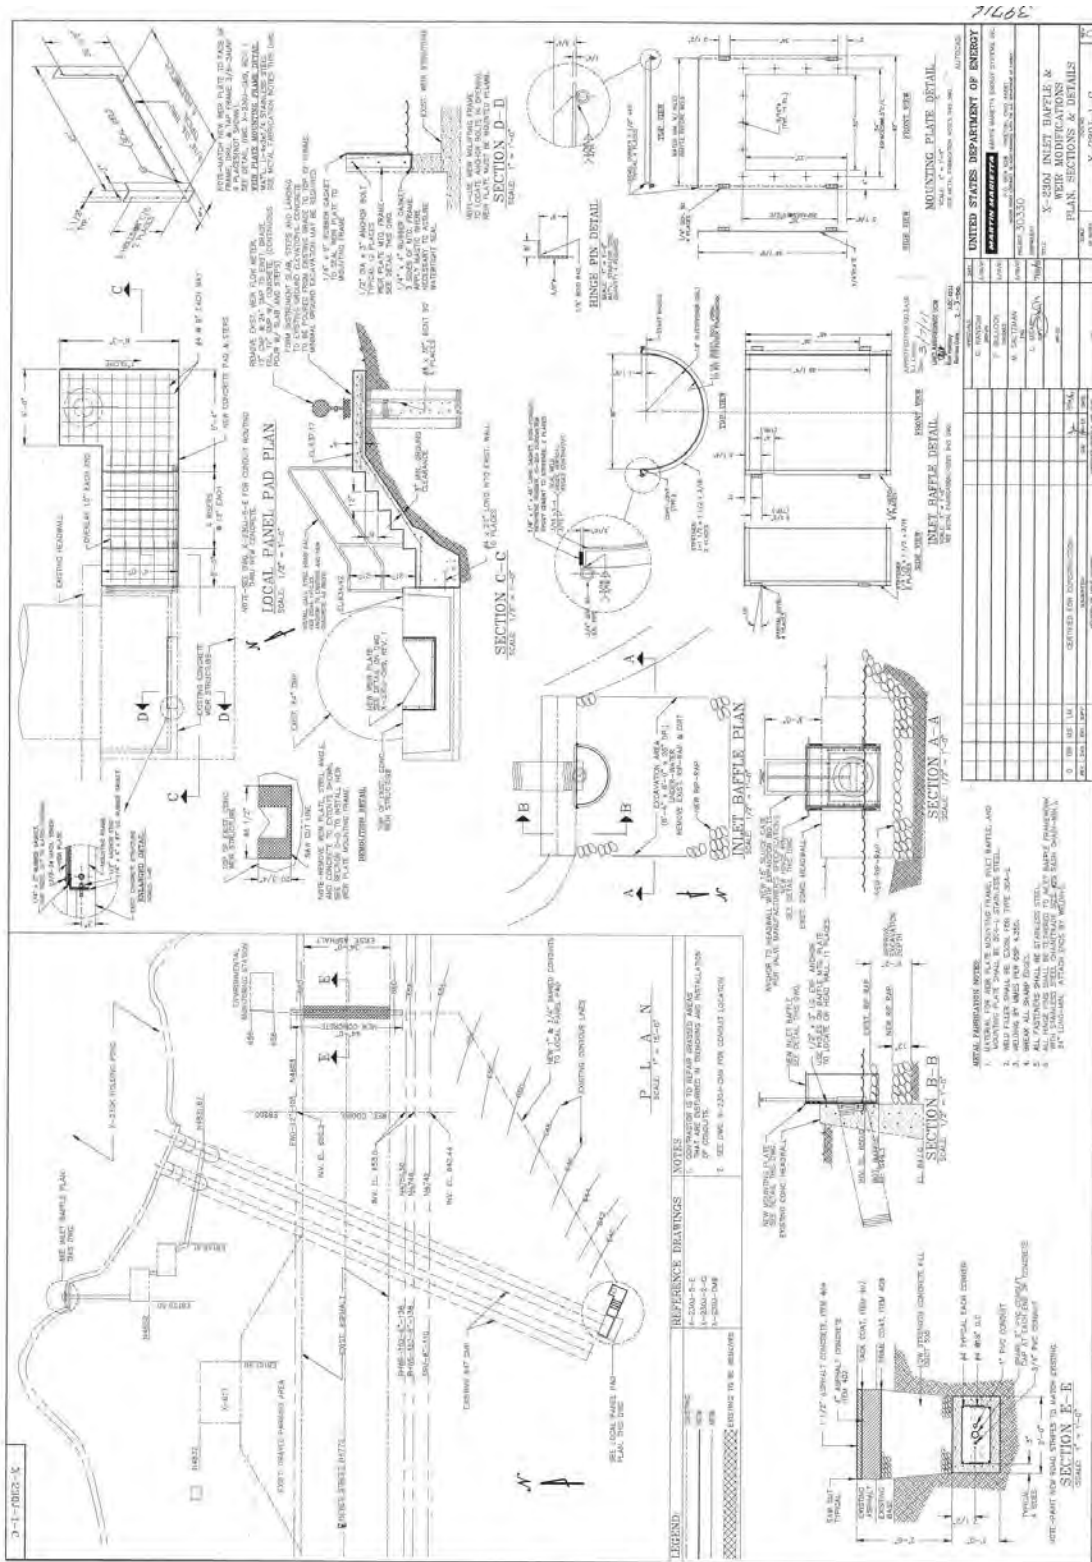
Inlet Baffle and Weir Modifications: Plan, Sections, and Details
